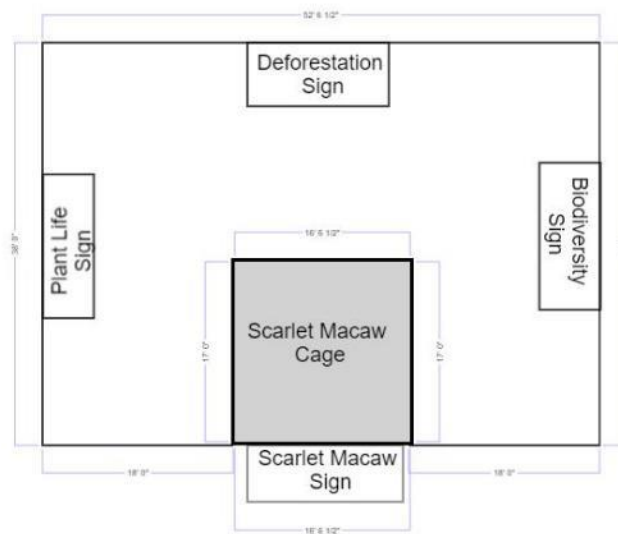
Floor plan of the nature preservation and restoration station.
